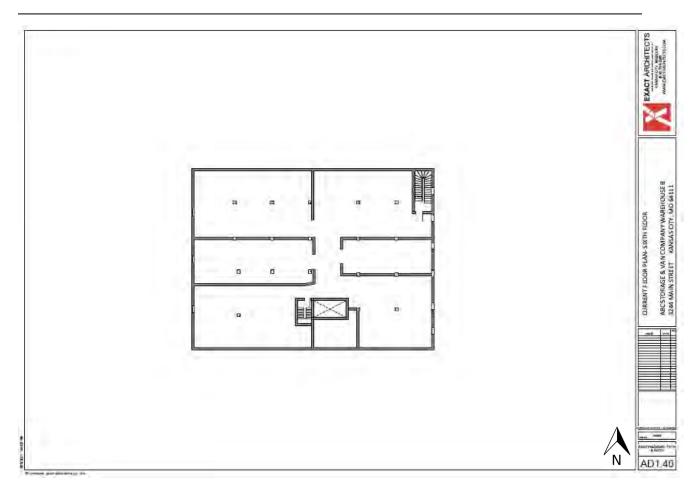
ABC Storage & Van Company Warehouse B current floor plan, sixth floor Source: Exact Architects
